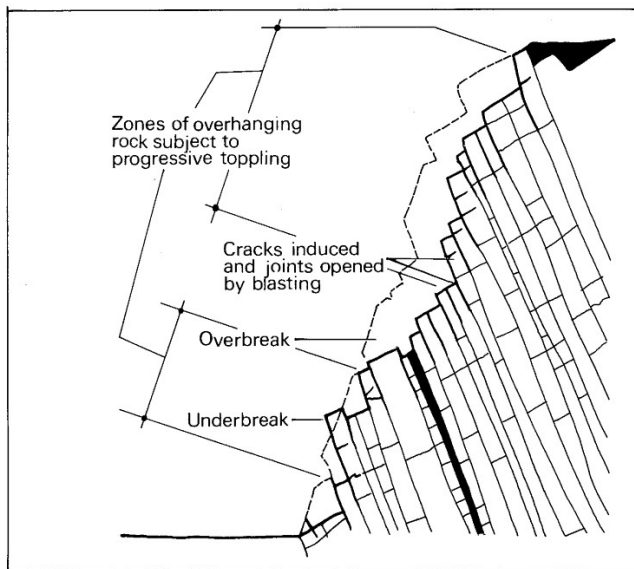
Uncontrolled excavation in rock mass prone to toppling failure
